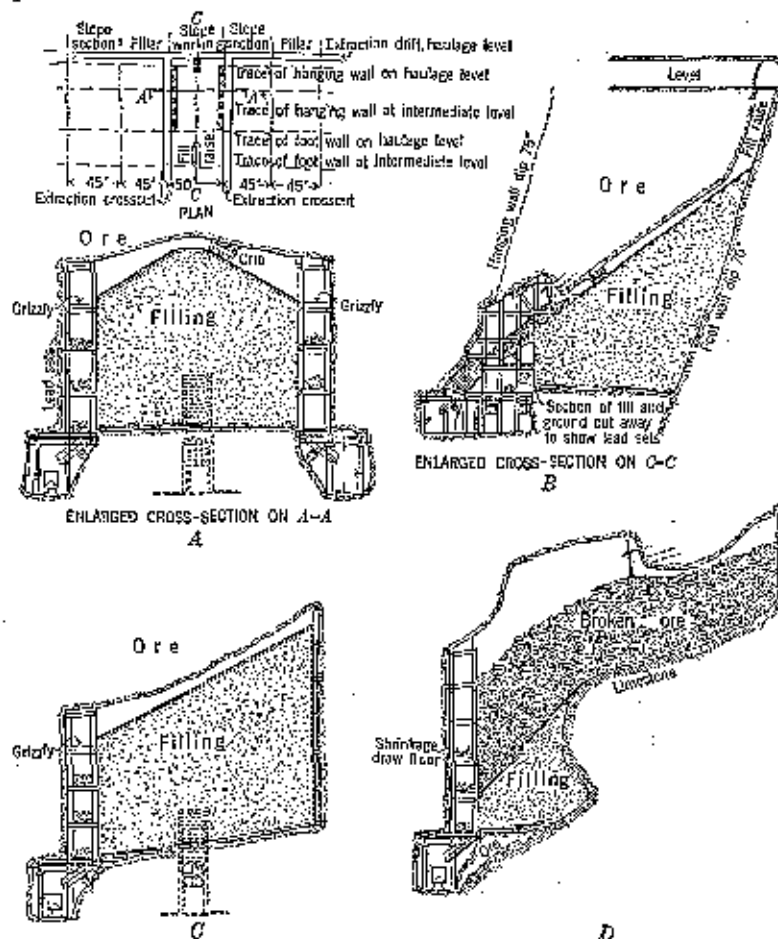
Inclined cut-and-fill stoping system, Campbell mine, Arizona: *A*, Plan and section of double-lead stope; *B*, cross section on lines C-C of plan *A*; *C*, cross section, single-lead stope; *D*, cross section of semi-shrinkage stope.
